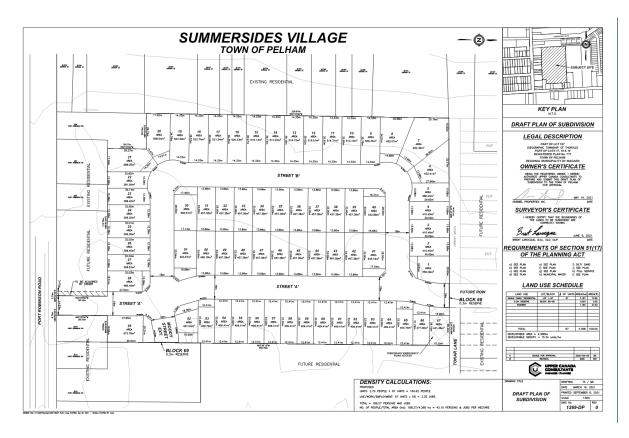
Draft Plan Summersides Village Submitted September 30th, 2021
